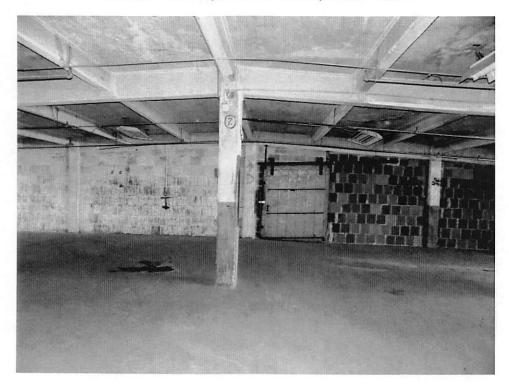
Interior, fourth floor Unit E, terra cotta wall and automatic fire door, looking north.
